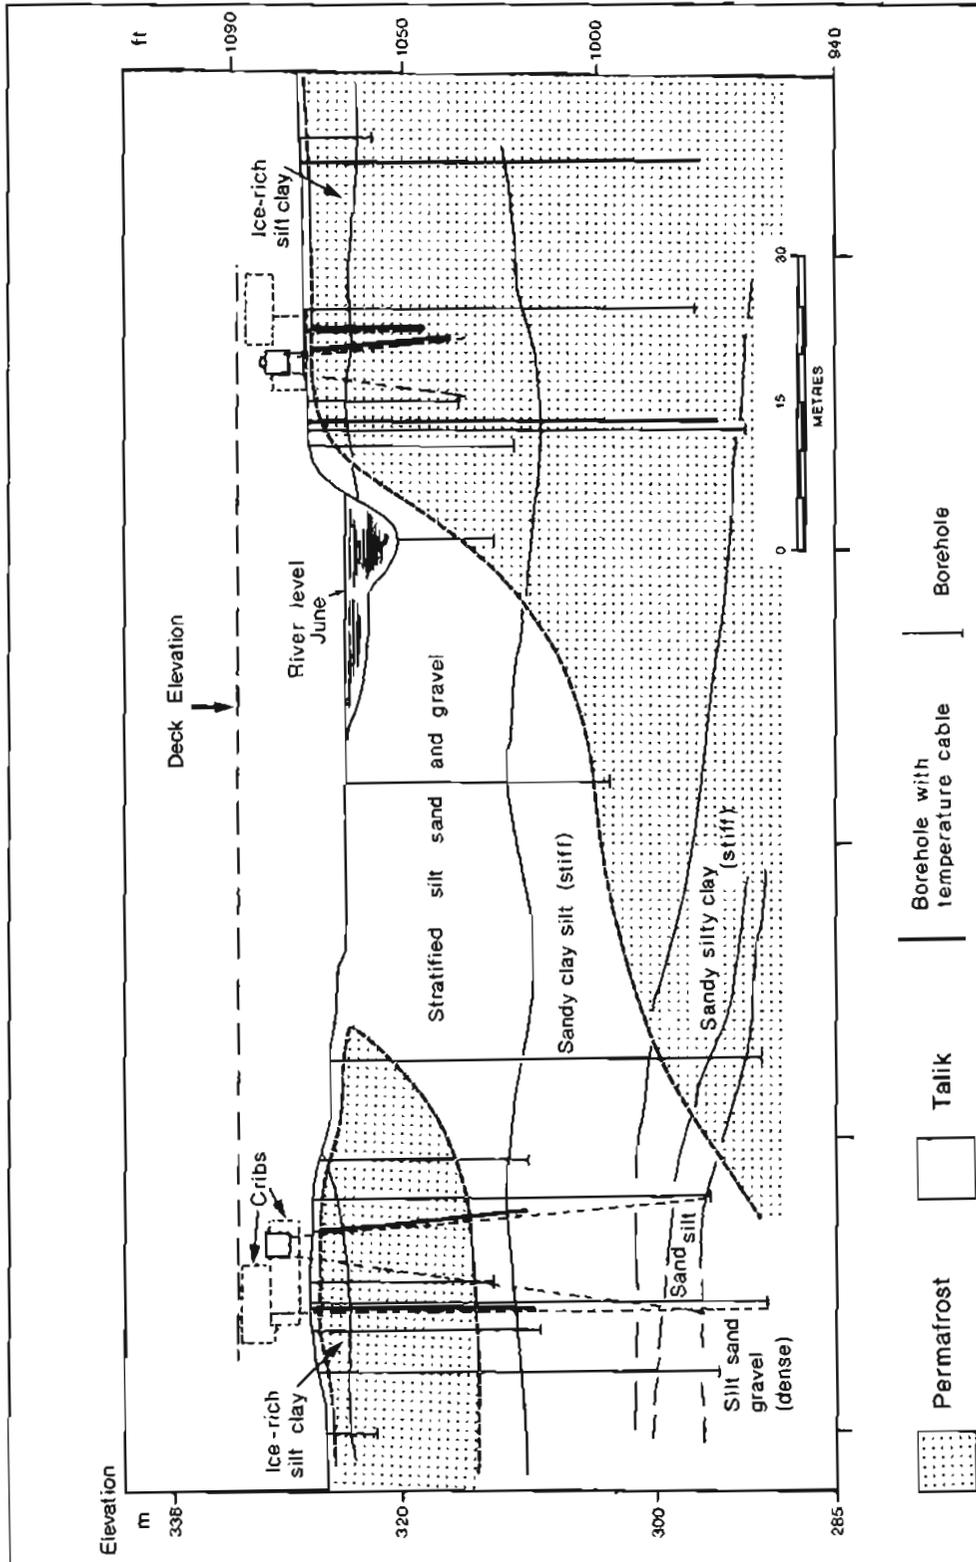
Plan and profile at Eagle River bridge site with stratigraphic and permafrost information determined by drilling (Johnston, 1980).
